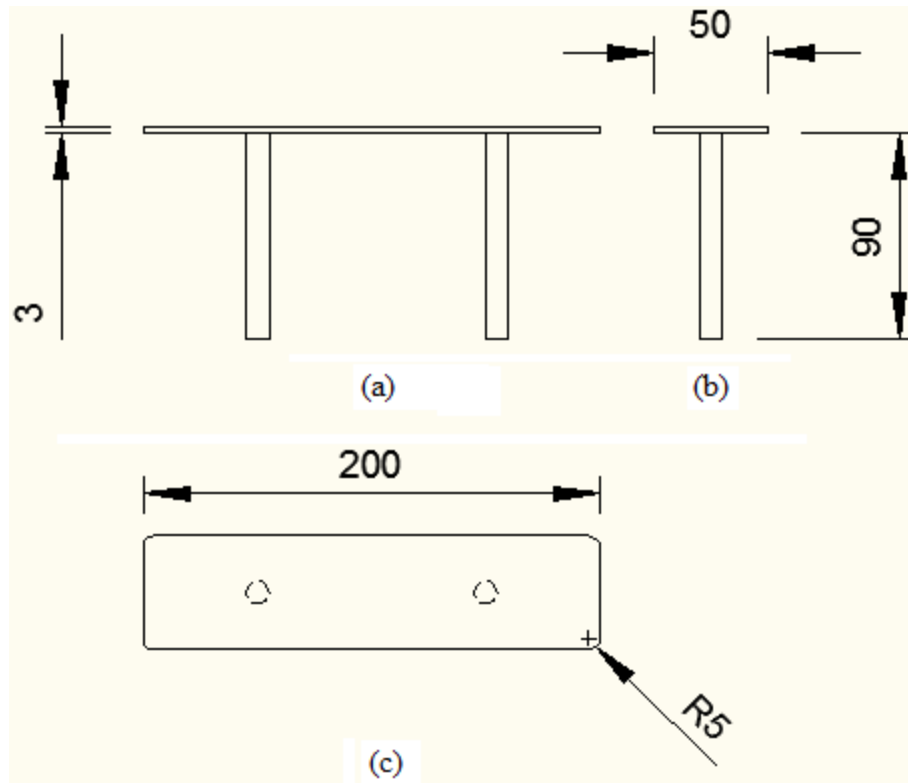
Schematic of CFRP anchors (a) Elevation view, (b) Side view and (c) Plan view
